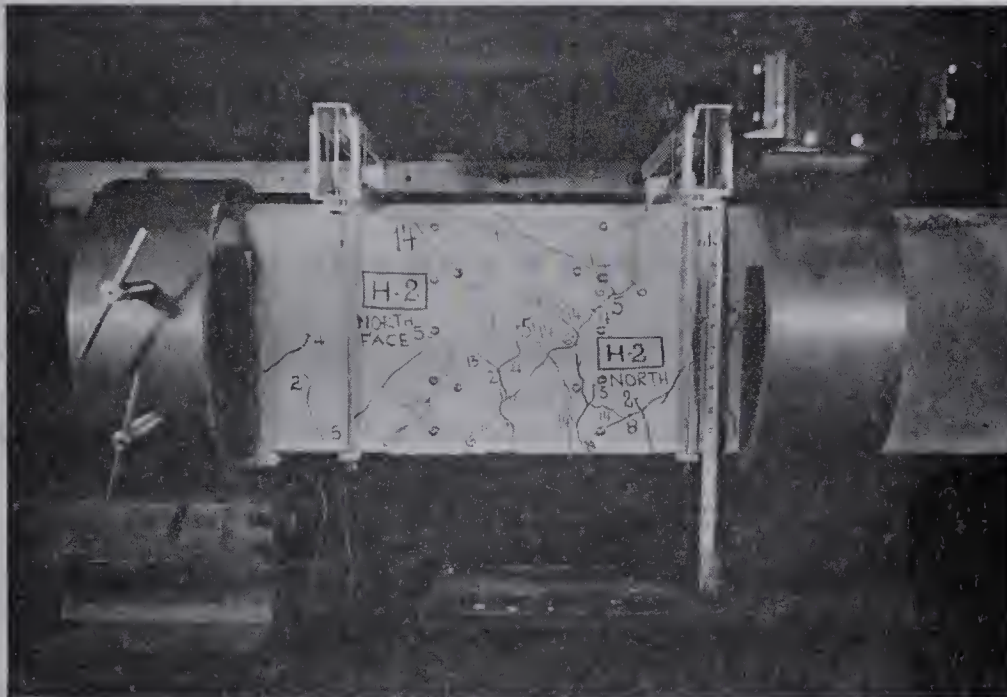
CRACK PATTERN FOR NORTH FACE OF BEAM H-2
